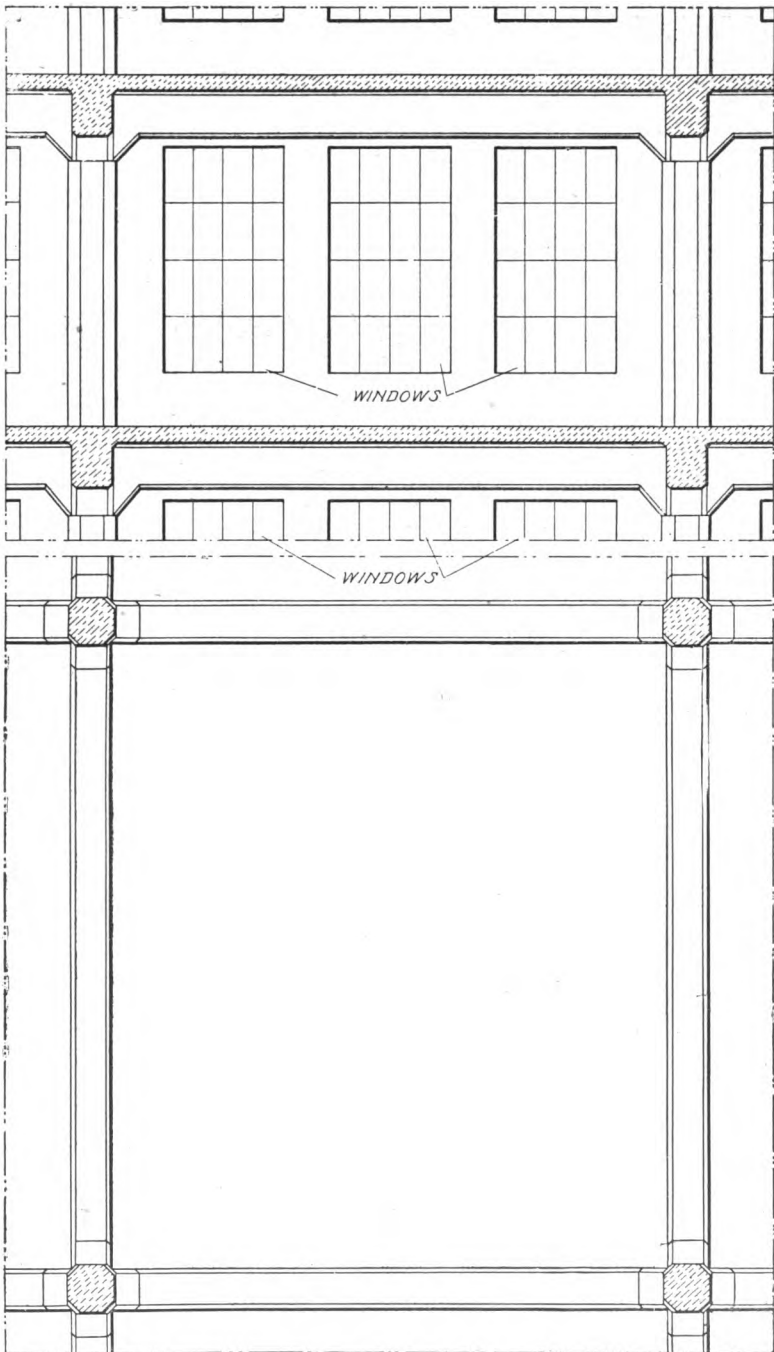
Reinforced Concrete Floor Construction of the Girder and Slab Type
